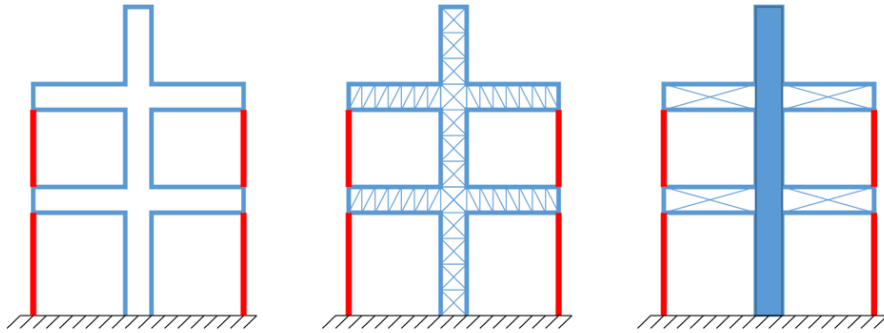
Typical diagrammatic drawings for outriggers. On the left, concrete core with concrete outriggers; in the middle, steel braced core with steel truss outriggers; on the right, concrete core with steel truss outriggers (Source: [10])
